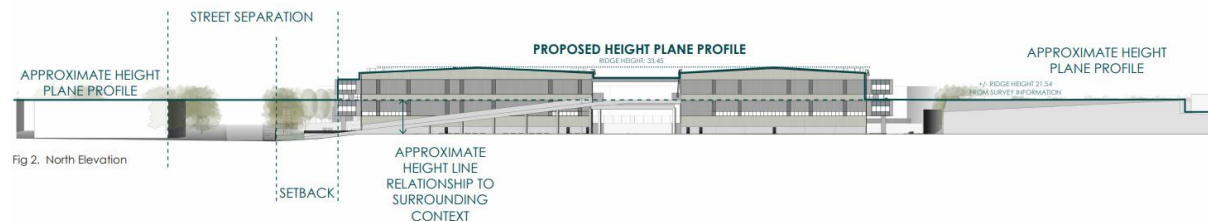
Height Context – North Elevation (Source: SBA Architects, 2023)
